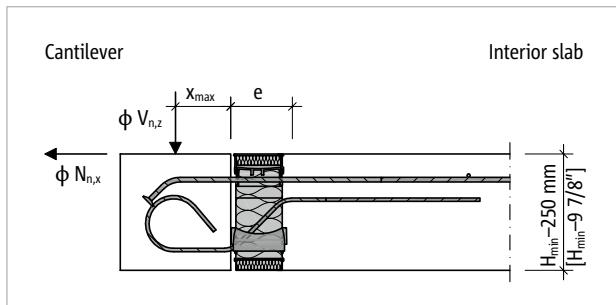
Schöck Isokorb® T Type CO: Distance of the load application point  $x$  (load distance point)
